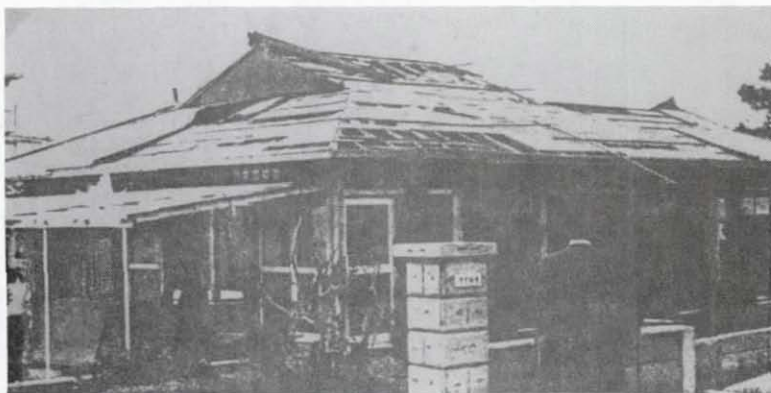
DAMAGE TO SHEET METAL ROOFING WITH BED BOARDS
